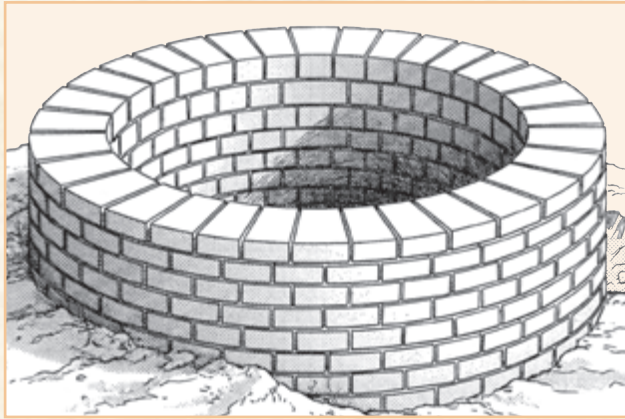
A simplified sketch of a typical Harappan well built with trapezoid-shaped bricks.
